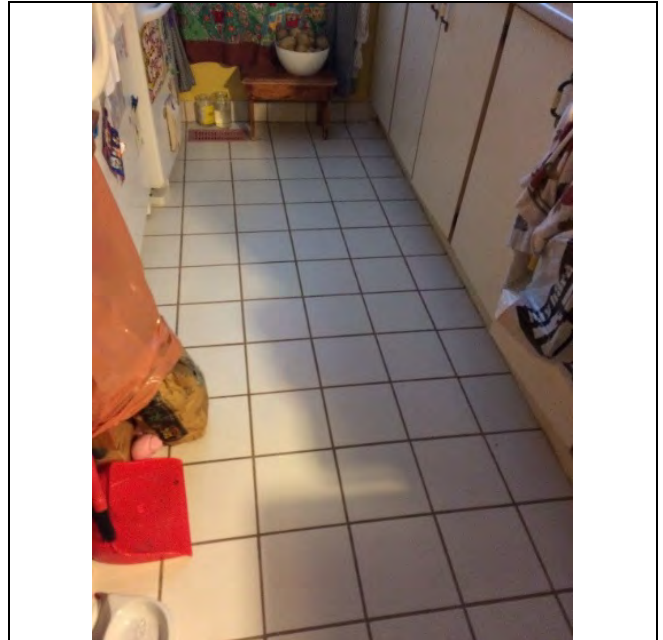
Presumed asbestos-containing ceramic tile grout and mortar / adhesive was observed in the kitchen.
